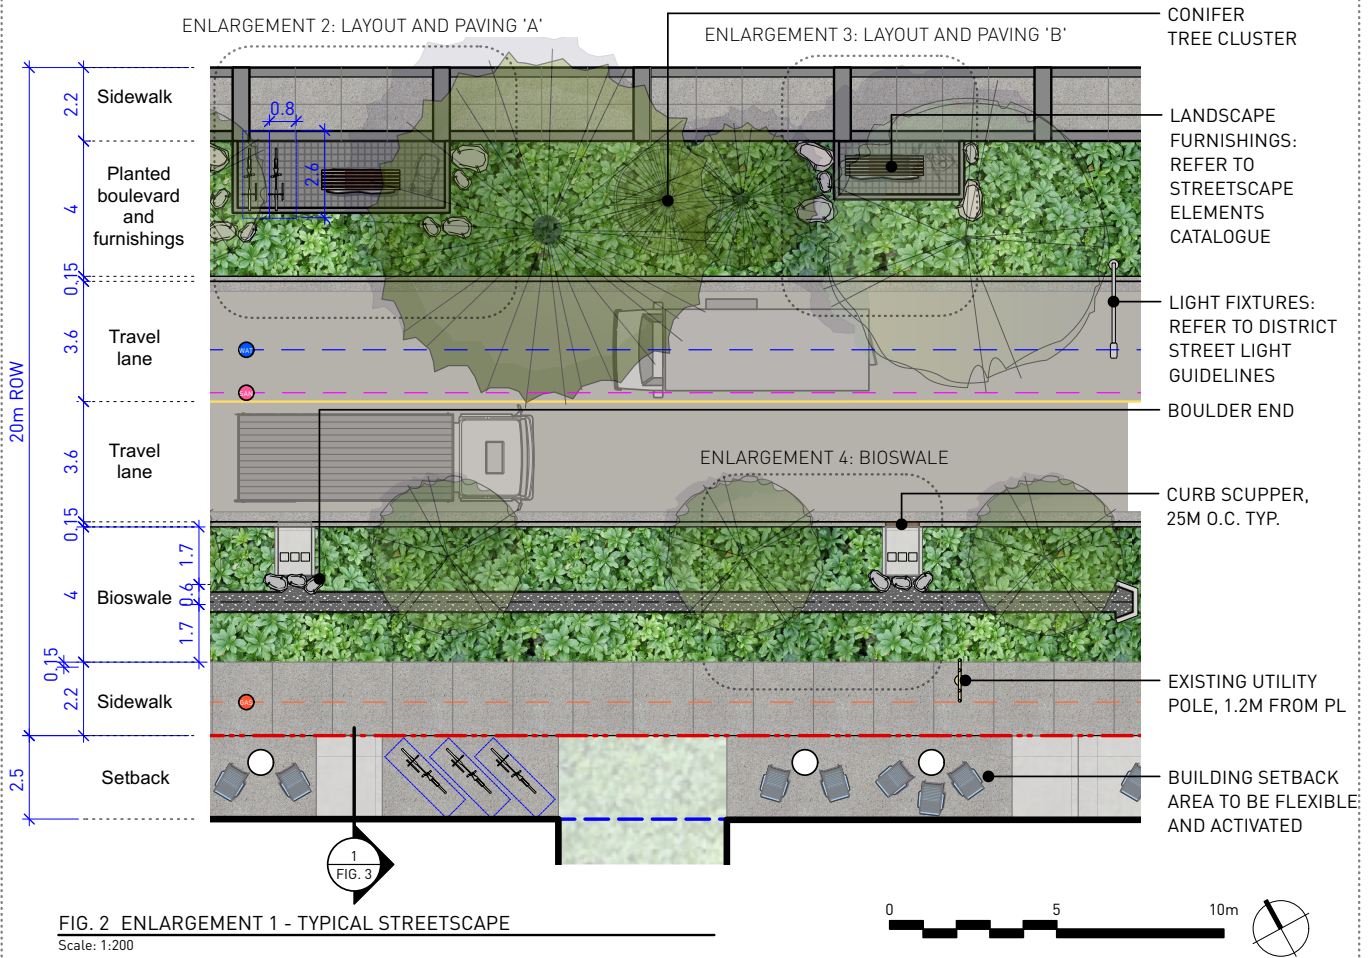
ENLARGEMENT 1 - TYPICAL STREETSCAPE
